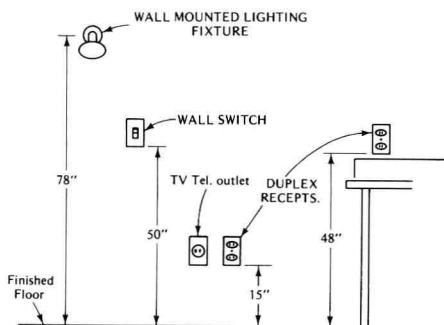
Detail showing mounting height of wall switches, receptacles, and wall mounted lighting fixtures.
